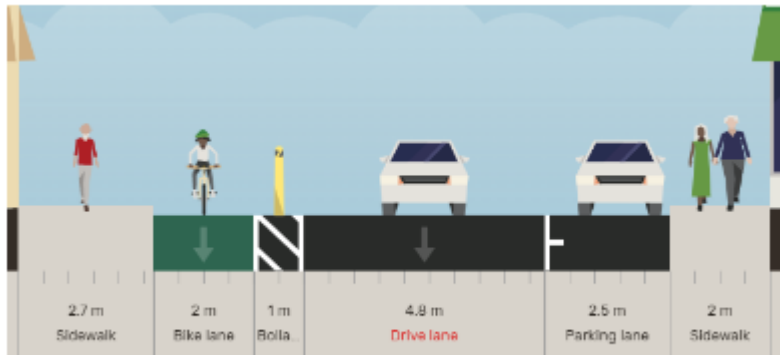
NS-2UA/3UB/3BA Cross section B (looking south)
